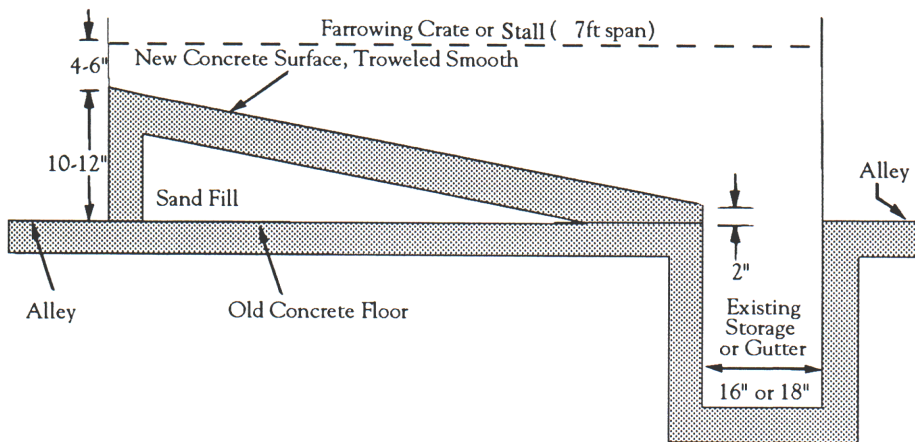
Sloping concrete surface to existing gutter under raised farrowing crate or stall.
